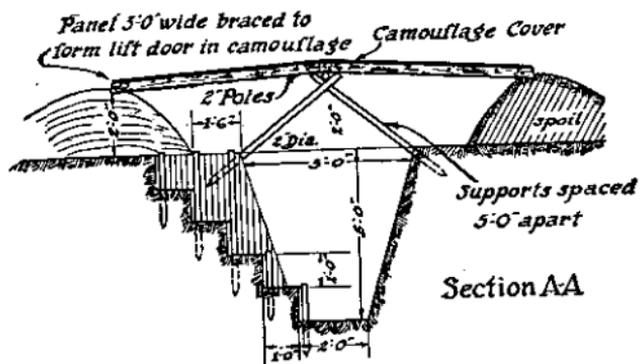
Two-gun heavy machine-gun emplacement with splinterproof shelter.
